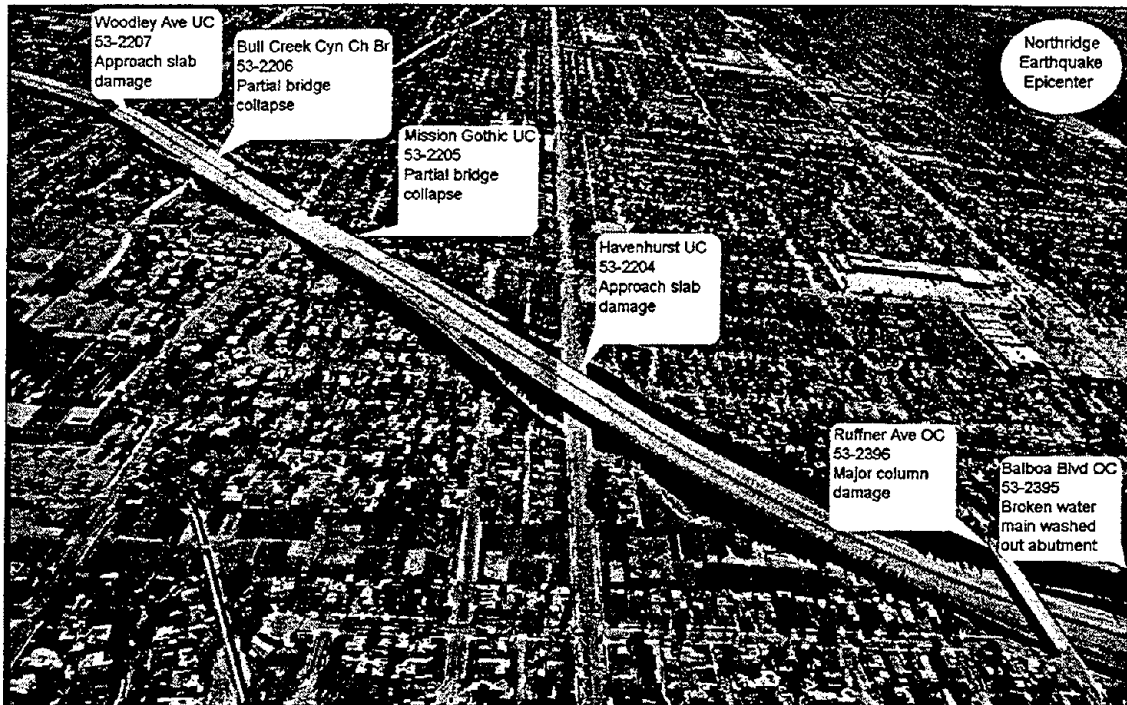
Bridge Damage at Location #3 -Route 118 west of Route 405.
